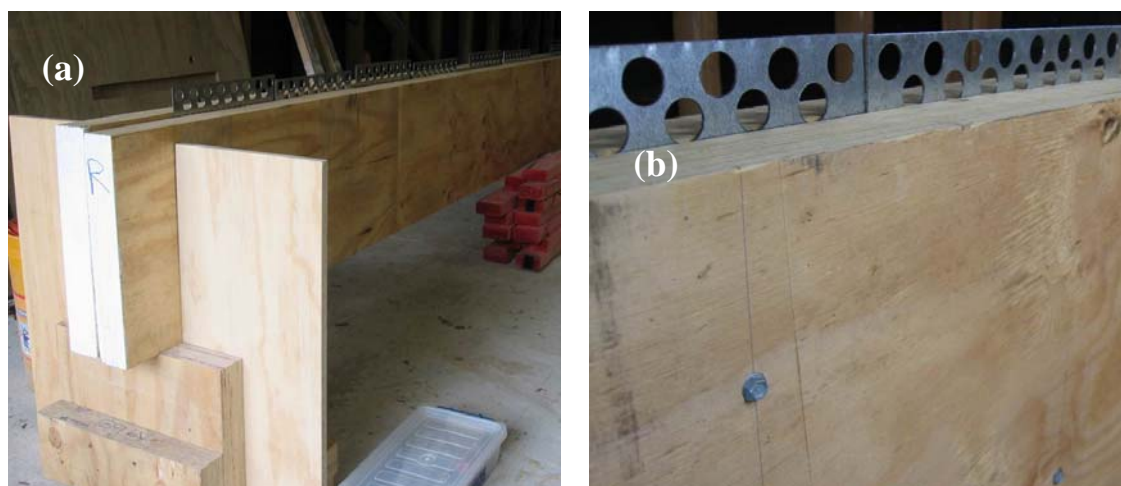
(a) Setting of double LVL for construction of 1200 mm wide TCC; (b) 2-LVL connected using type 17 screw
